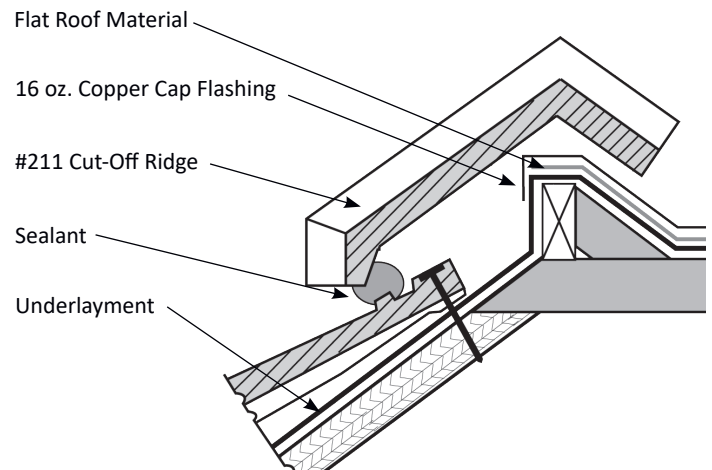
Deck Section with #211 Cut-Off Ridge
